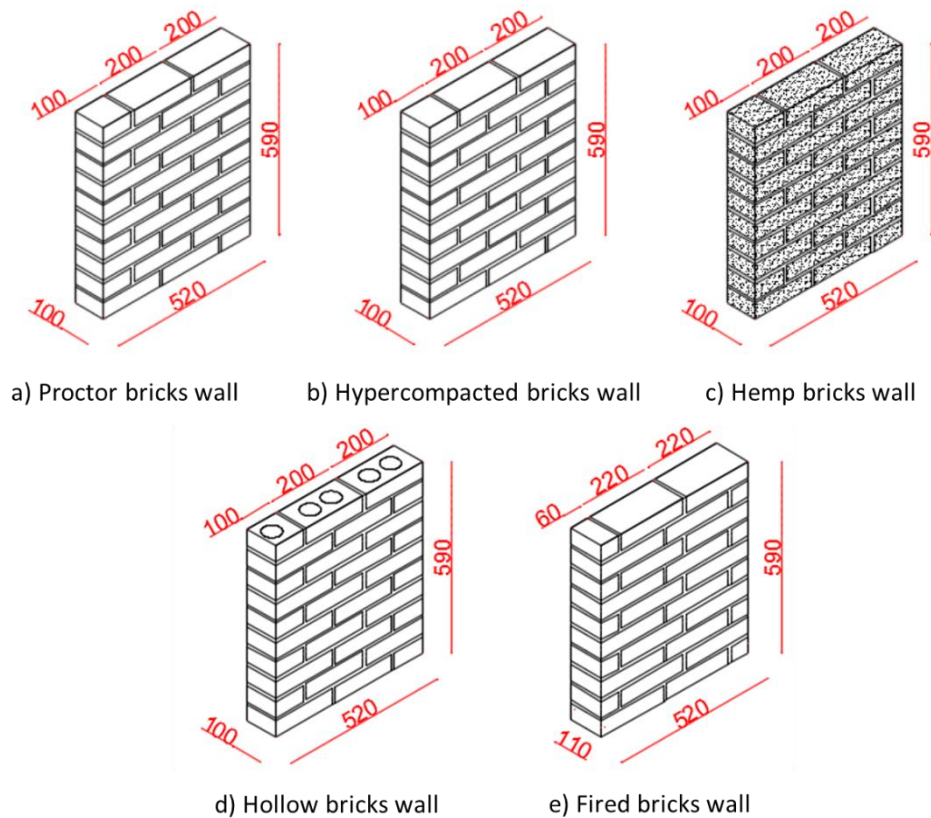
Representation of the five walls tested in the present work: a) Proctor brick wall, b) hypercompacted brick wall, c) hemp brick wall, d) hollow brick wall and e) fired brick wall.
